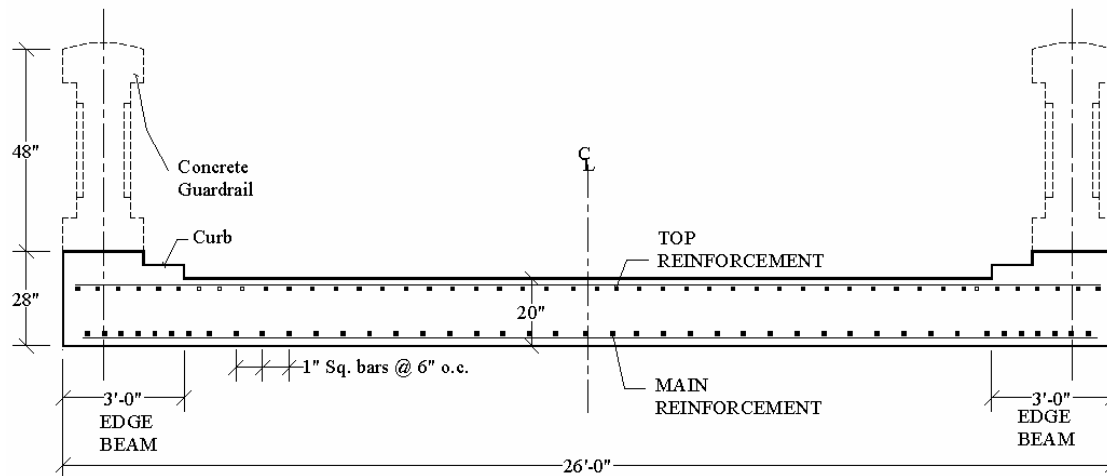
Transverse bridge section with main reinforcement running parallel to traffic
